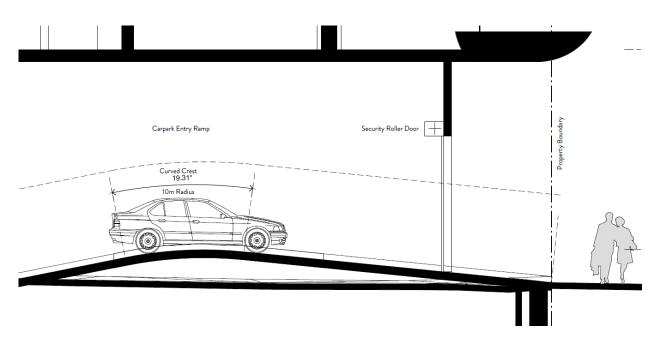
Design of vehicular entrance with crest to protect basement from flooding
